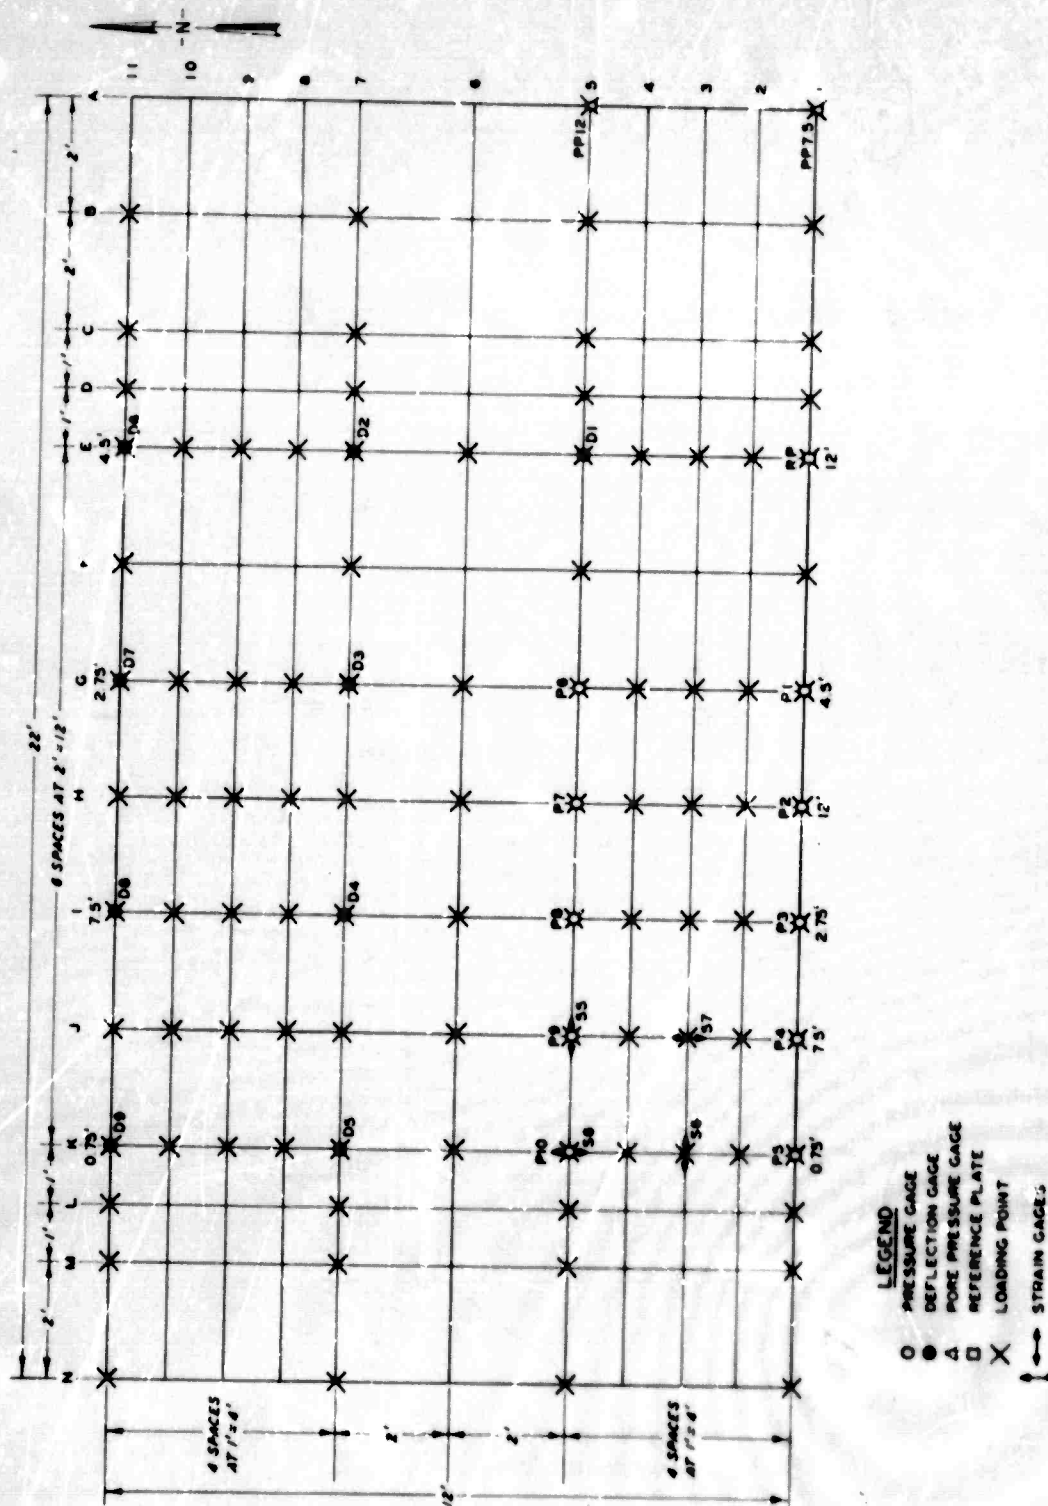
Static Loading Grid System, Item 3, Flexible Pavement Test Section
